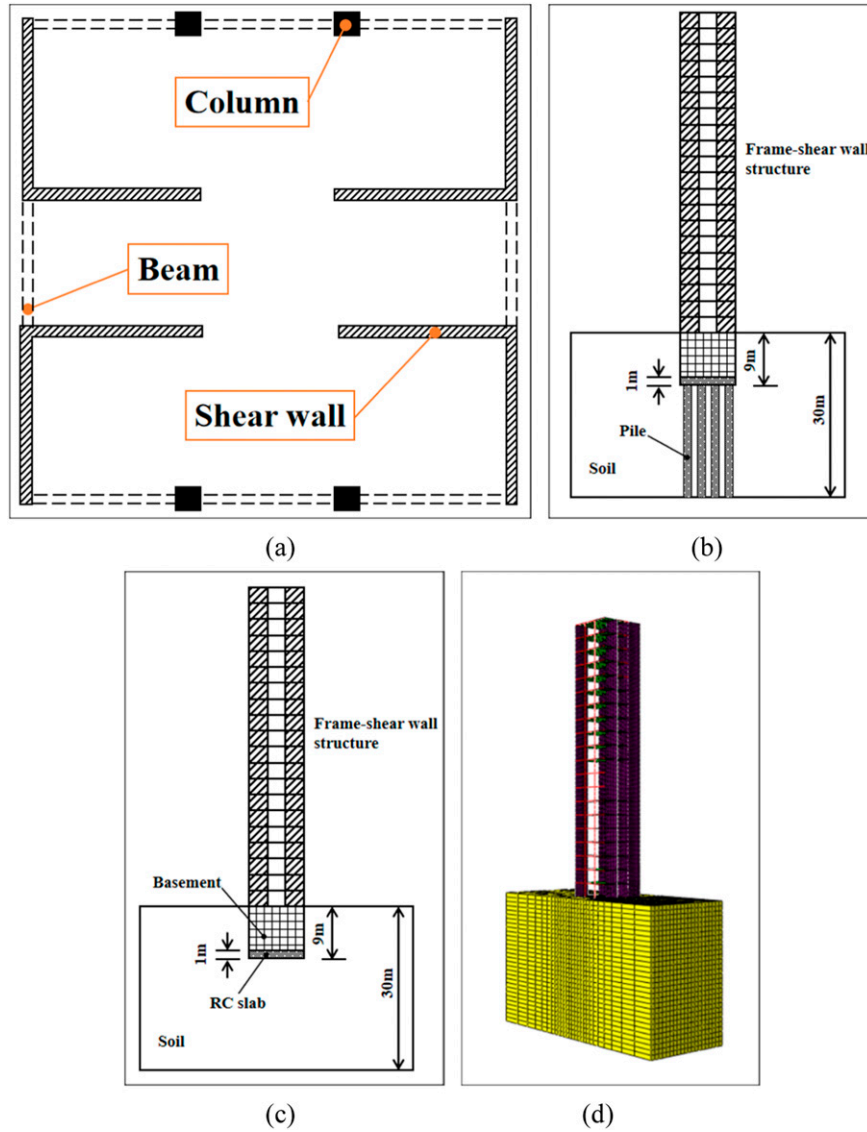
The setup of the frame-shear wall structure: (a) plan view of the standard storey (b) end bearing piled foundation-supported structure (c) classical compensated foundation-supported structure (d) the finite-element model.
